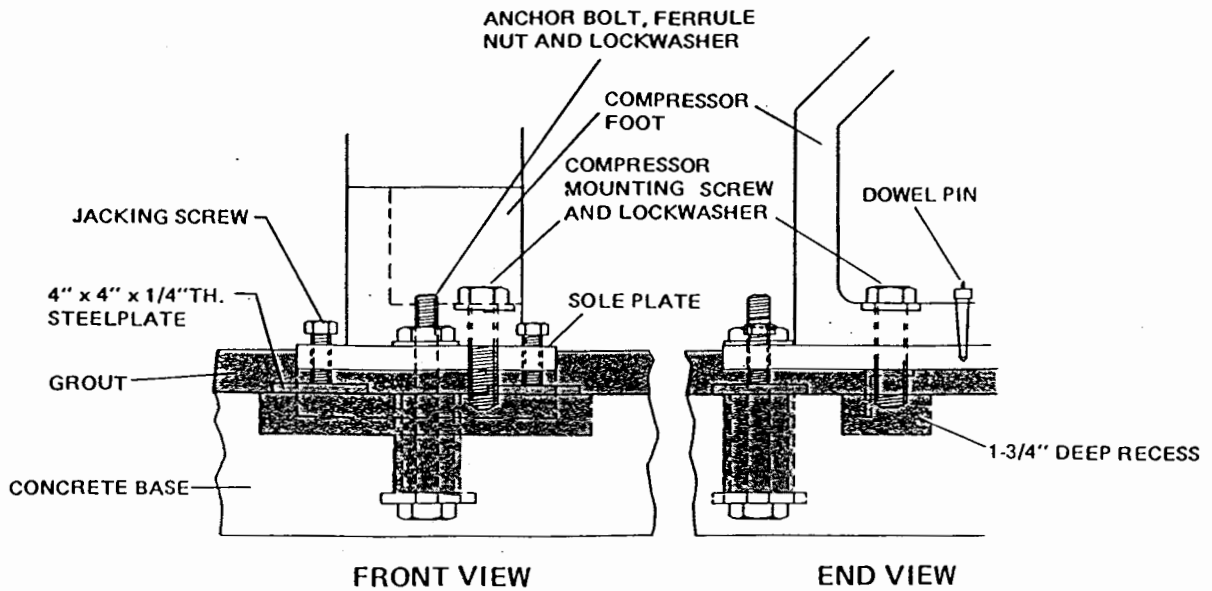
COMPRESSOR MOUNTING WITH GROUTING POURED
